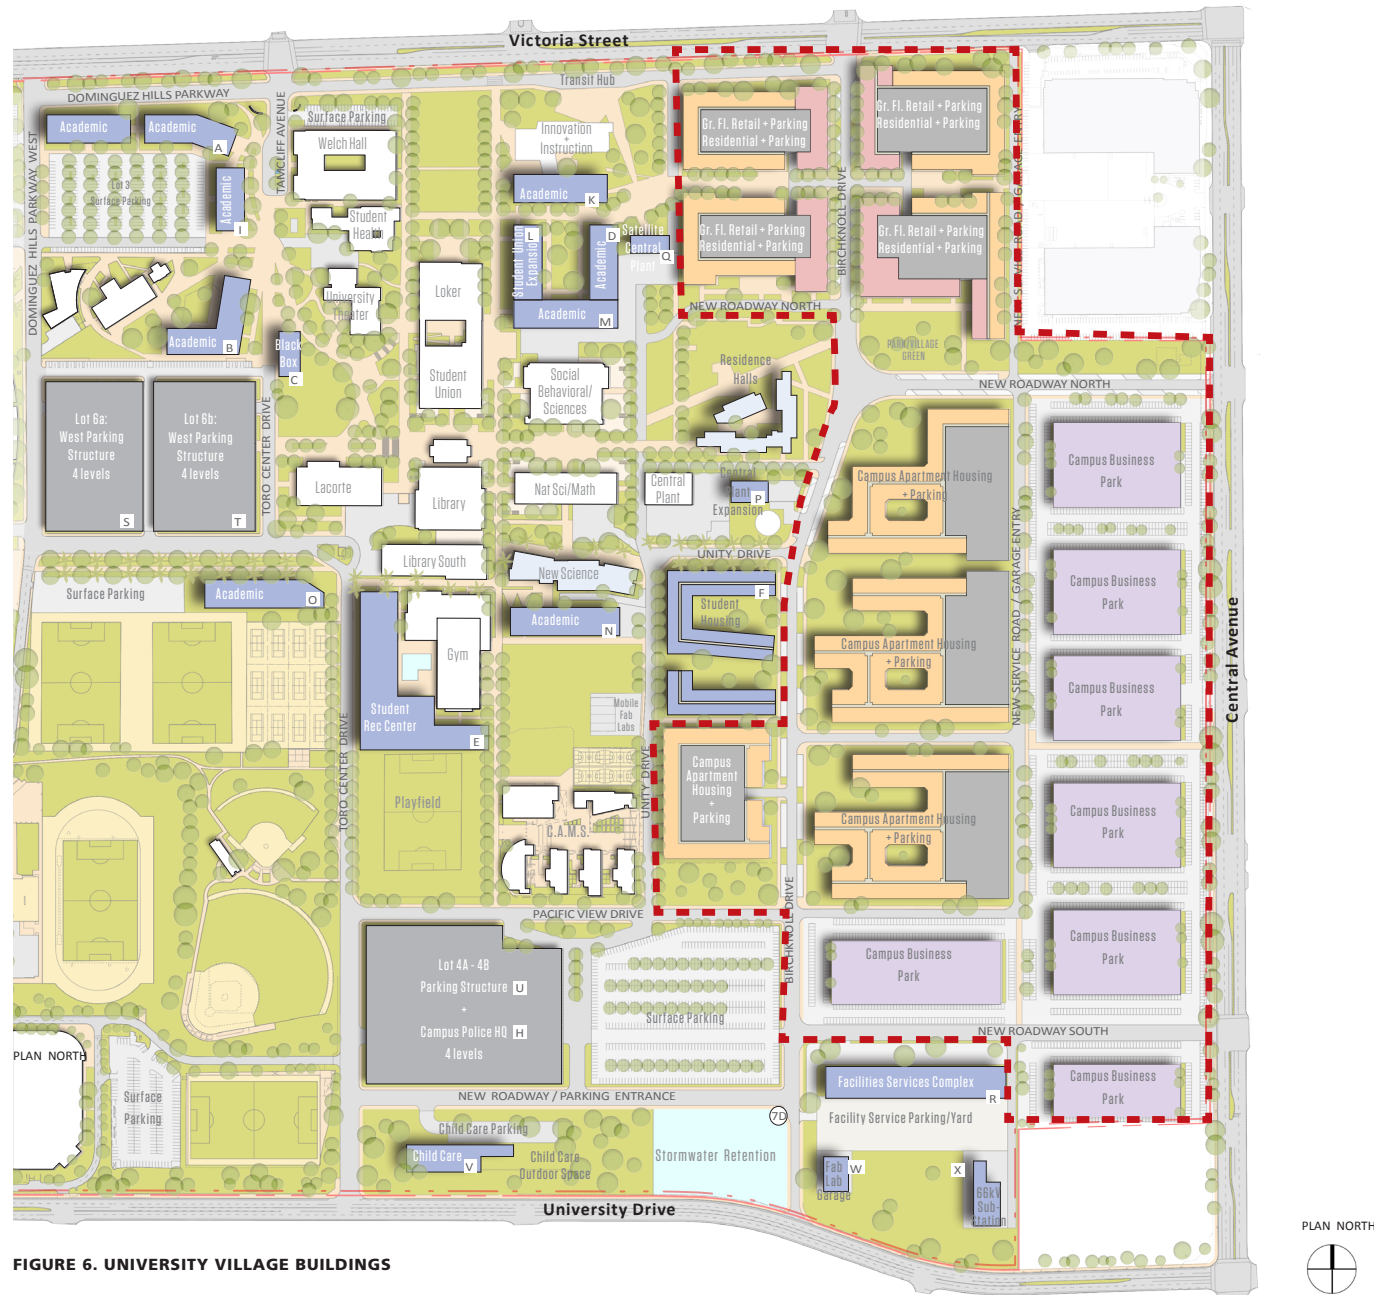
UNIVERSITY VILLAGE BUILDINGS
